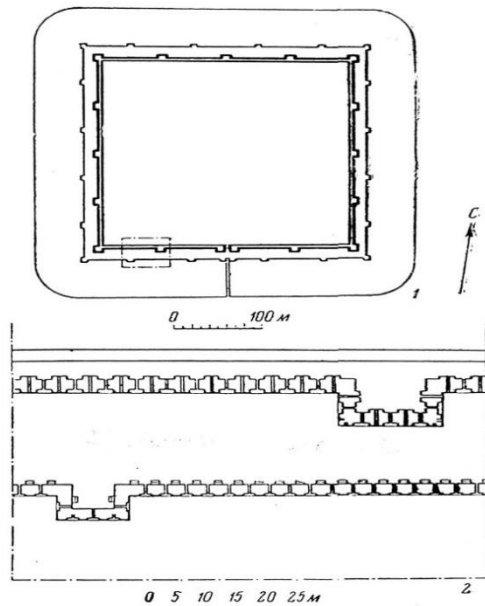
Plan of the early antique period fortress (1) and detail of the plan (2). Reconstruction
